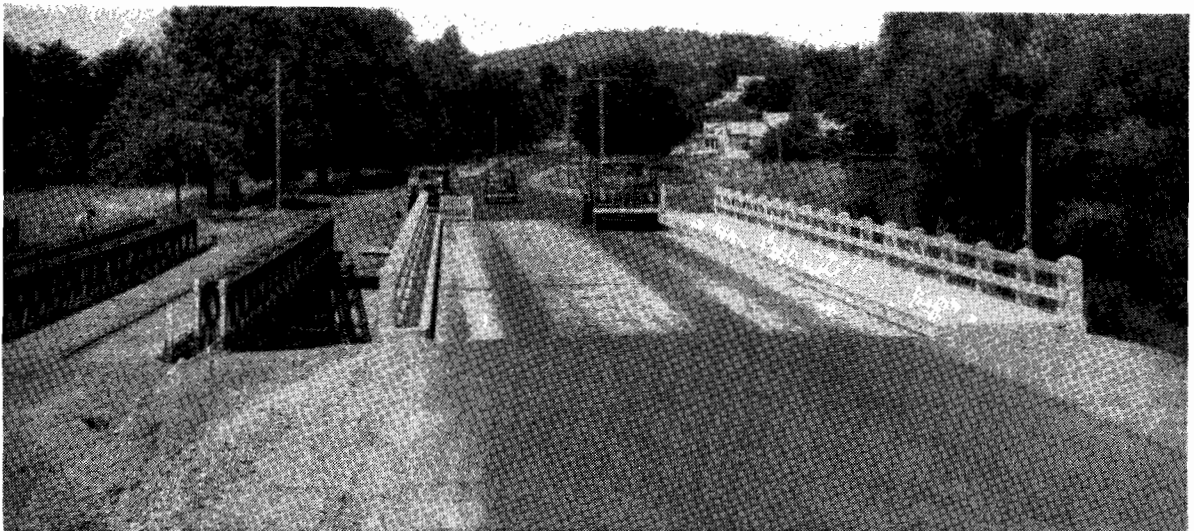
New bridge over Jackson's Creek on Calder Highway at Gisborne.
